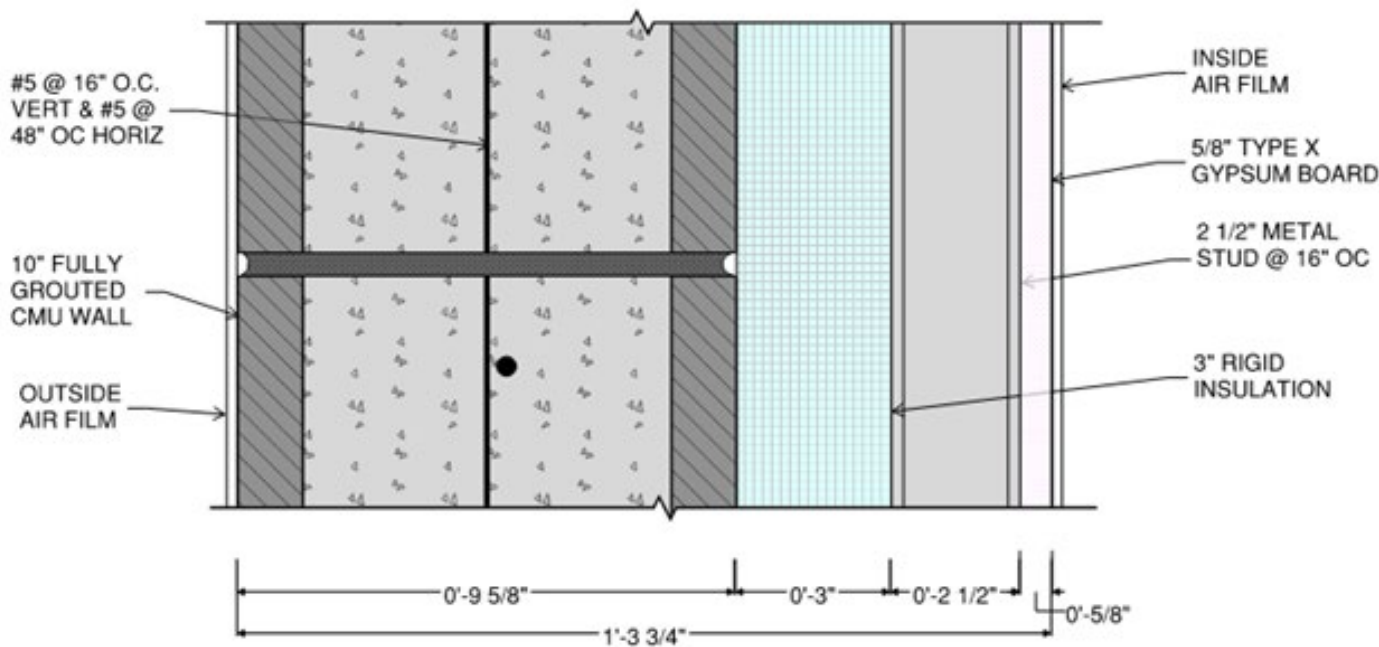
Non-structural concrete masonry unit wall assembly section detail
